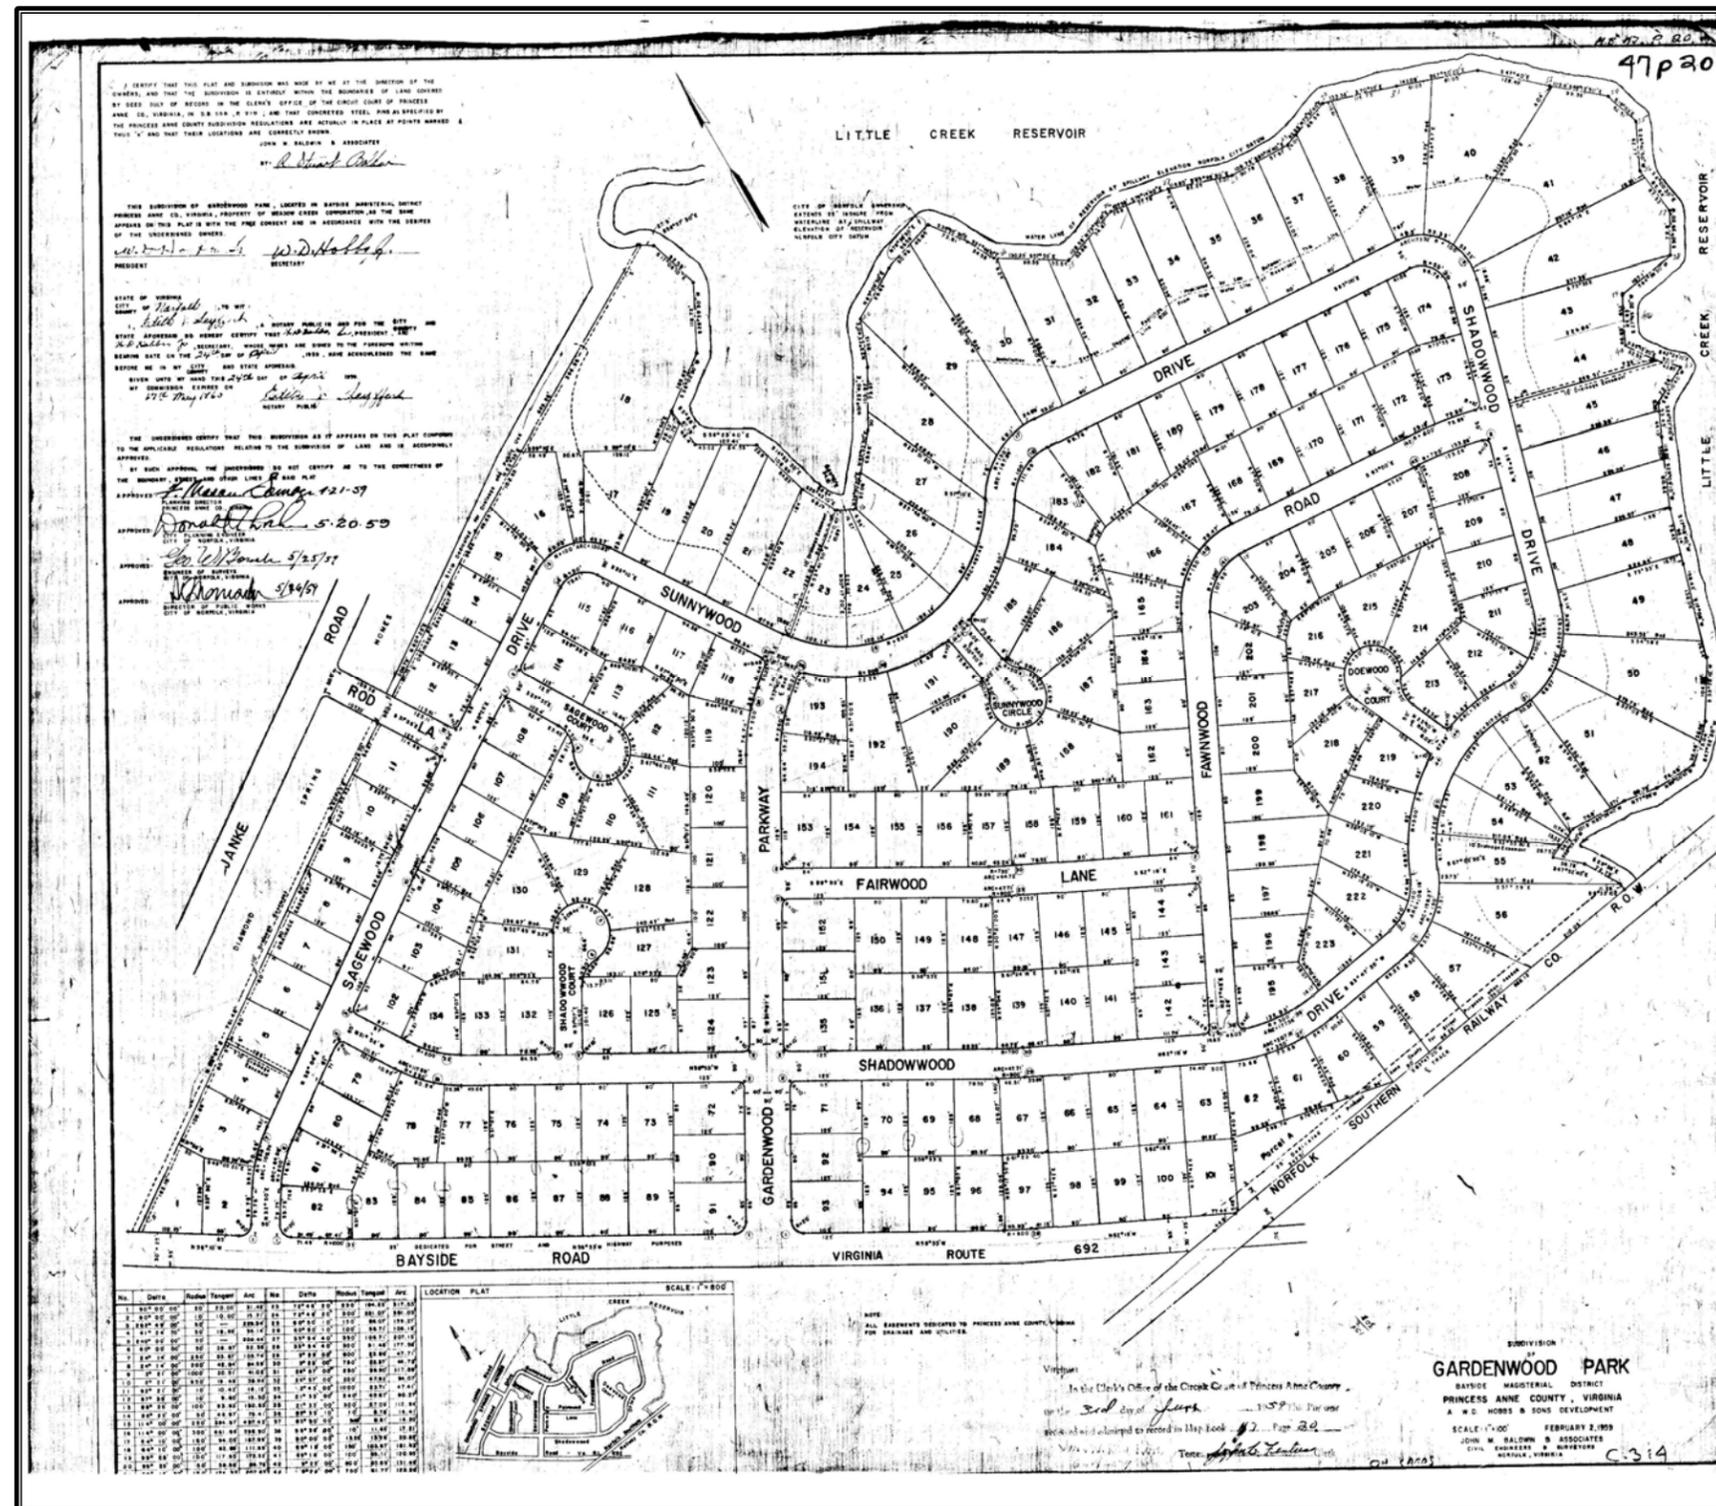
1959 Plat of Gardenwood Park (Source: Virginia Beach GIS)
